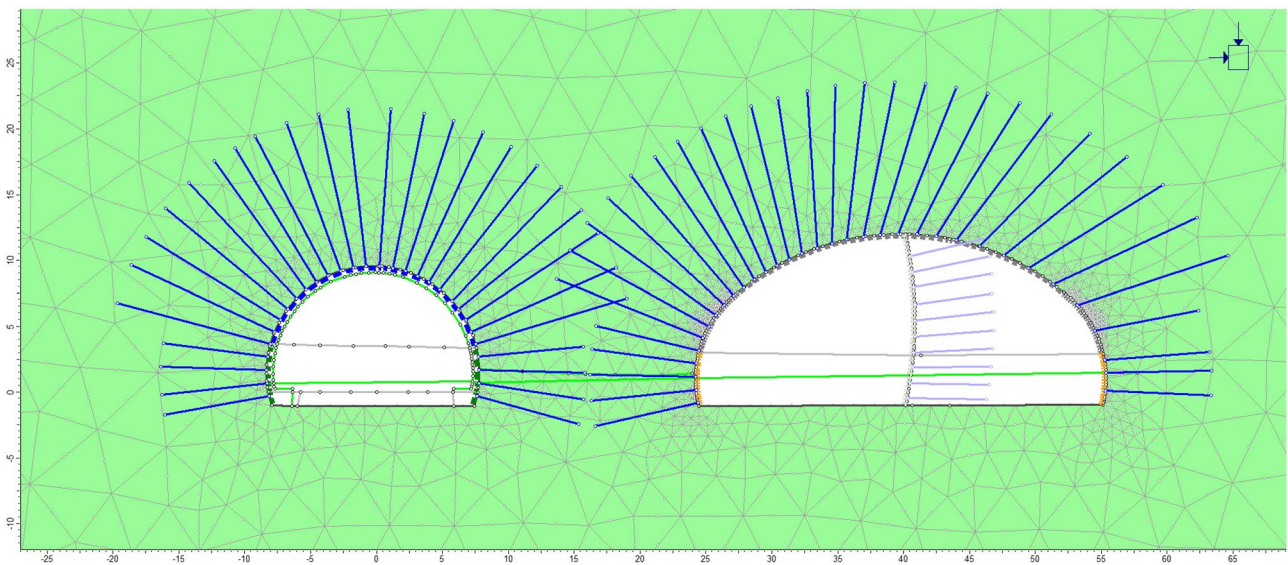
Bench support installation for second section of right tunnel; stage 13 in Table 5
